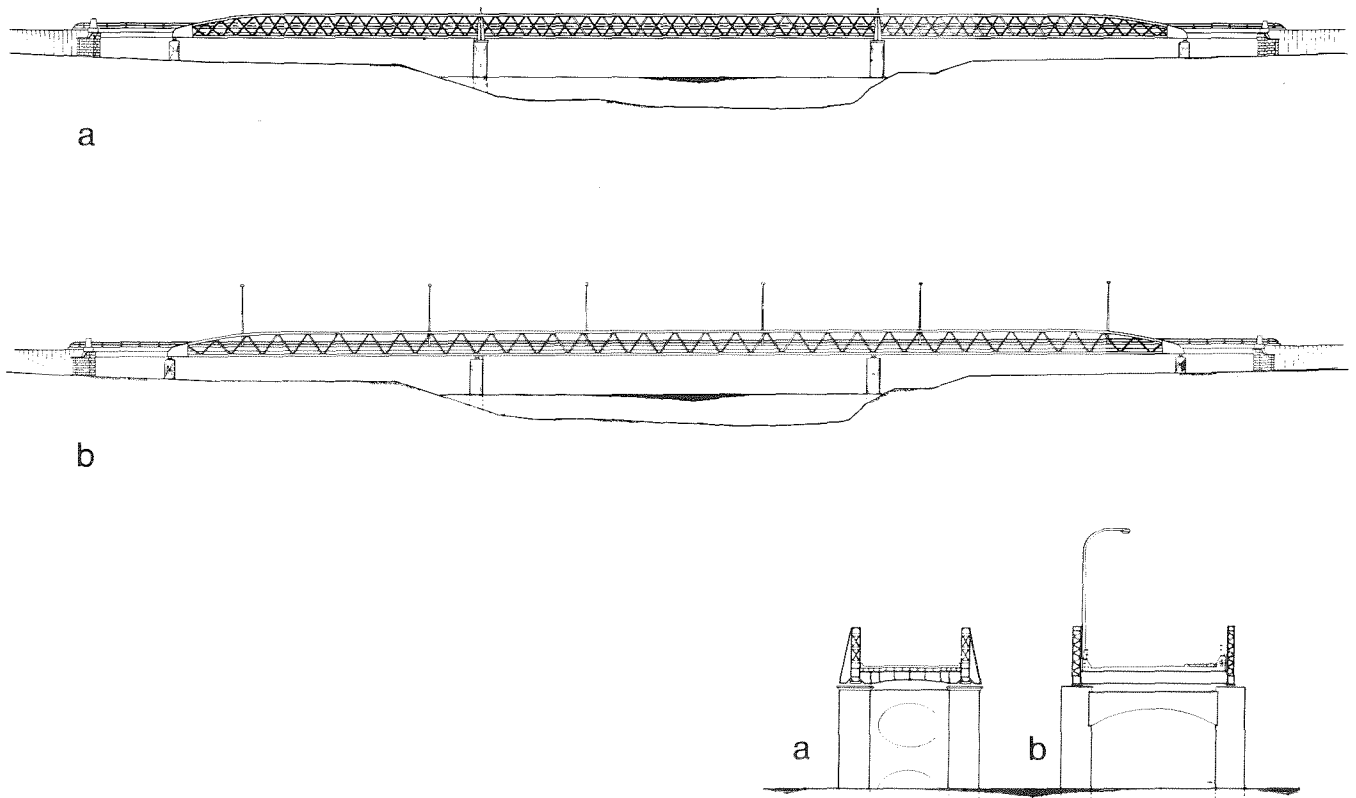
Lattice girder road bridges at Aberdeen. The new bridge (b) has spans, pier alignment and design similar to the old bridge (a) but utilises modern steel technology. Reproduced by courtesy of McMillan Britton & Kell Pty Ltd.
